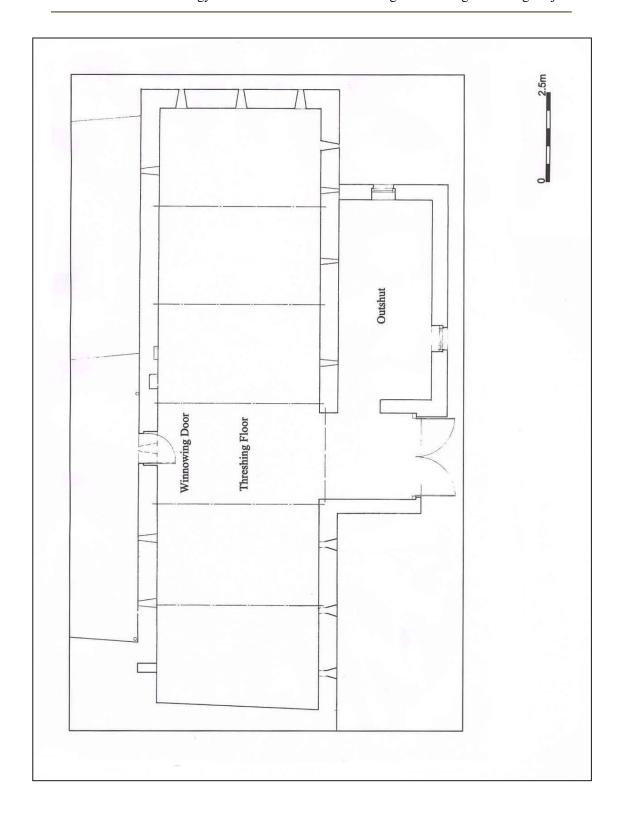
Plan of Upper Level of Bank Barn. Scale: 1:100
